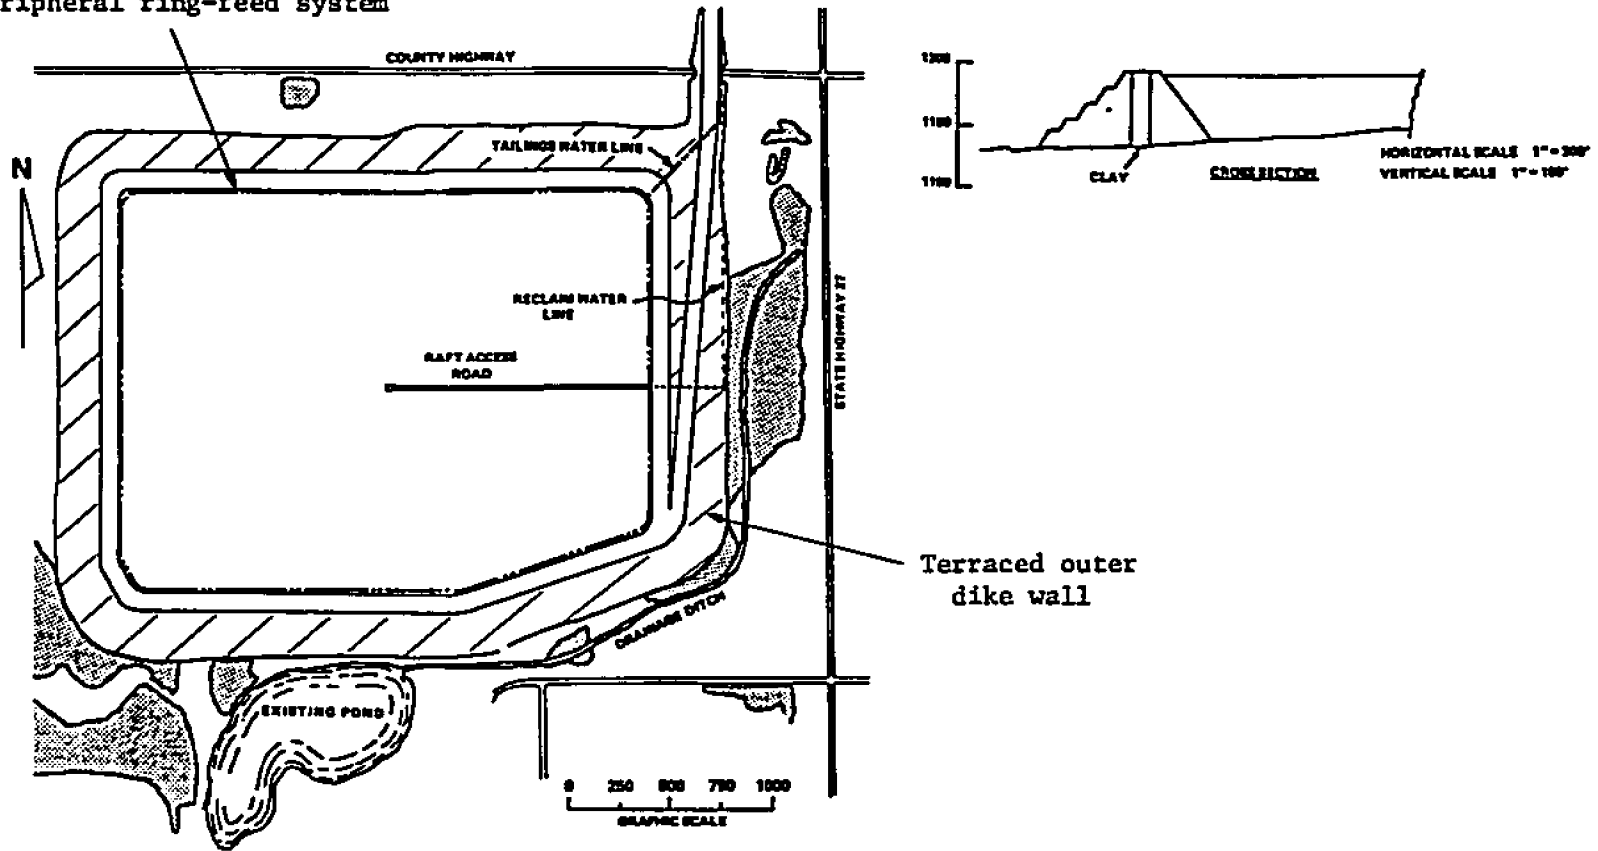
Plan view of the proposed waste-containment structure 1.2 mi south of the mine area. The cross section (above right) illustrates the construction of clay saprolite cores within the dike walls of the structure (modified from FMC, 1976).
